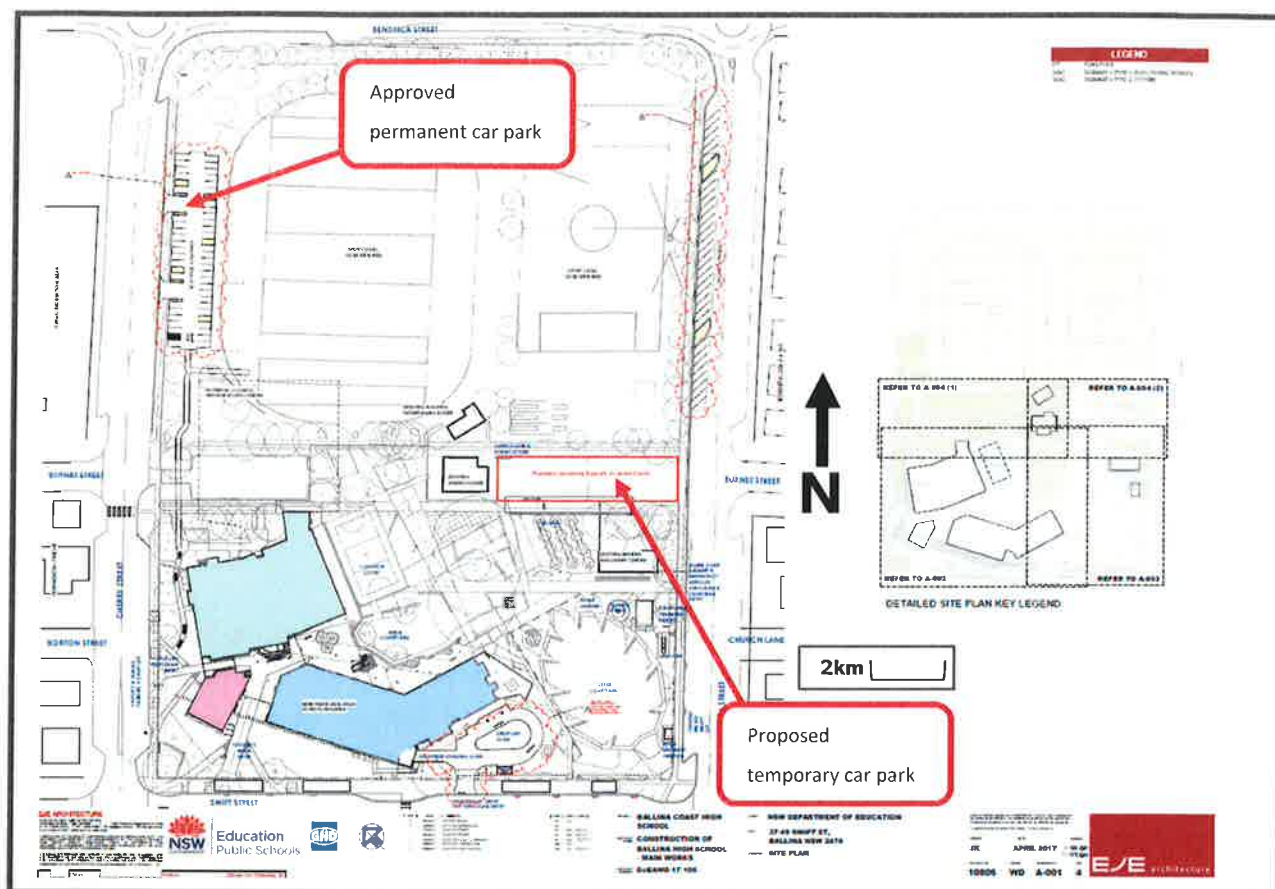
Site plan indicating location of approved permanent car park and proposed location of temporary car park
